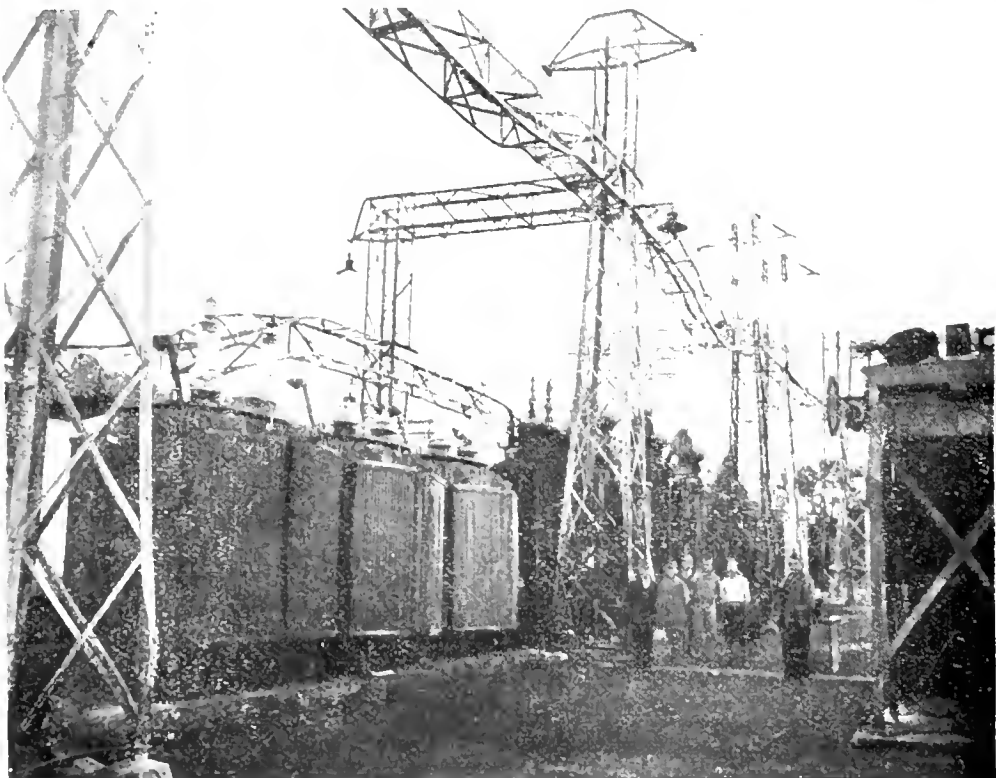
Chigasaki substation—General view through center bay showing steel structure collapse from heat
